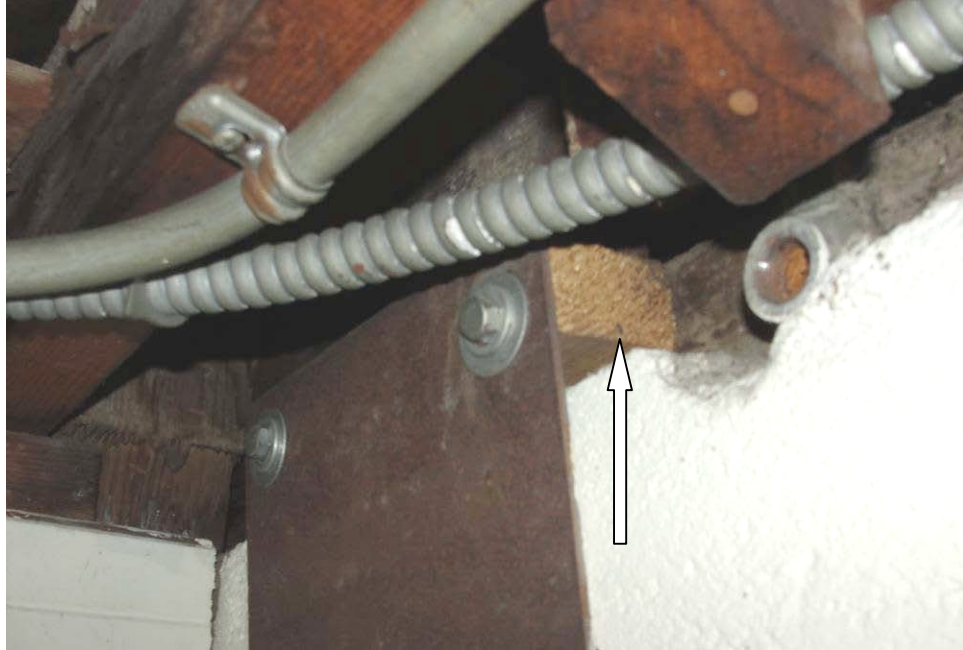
PHOTO: The foundation anchors are secured with wood blocks between the anchor and the mudsill.
